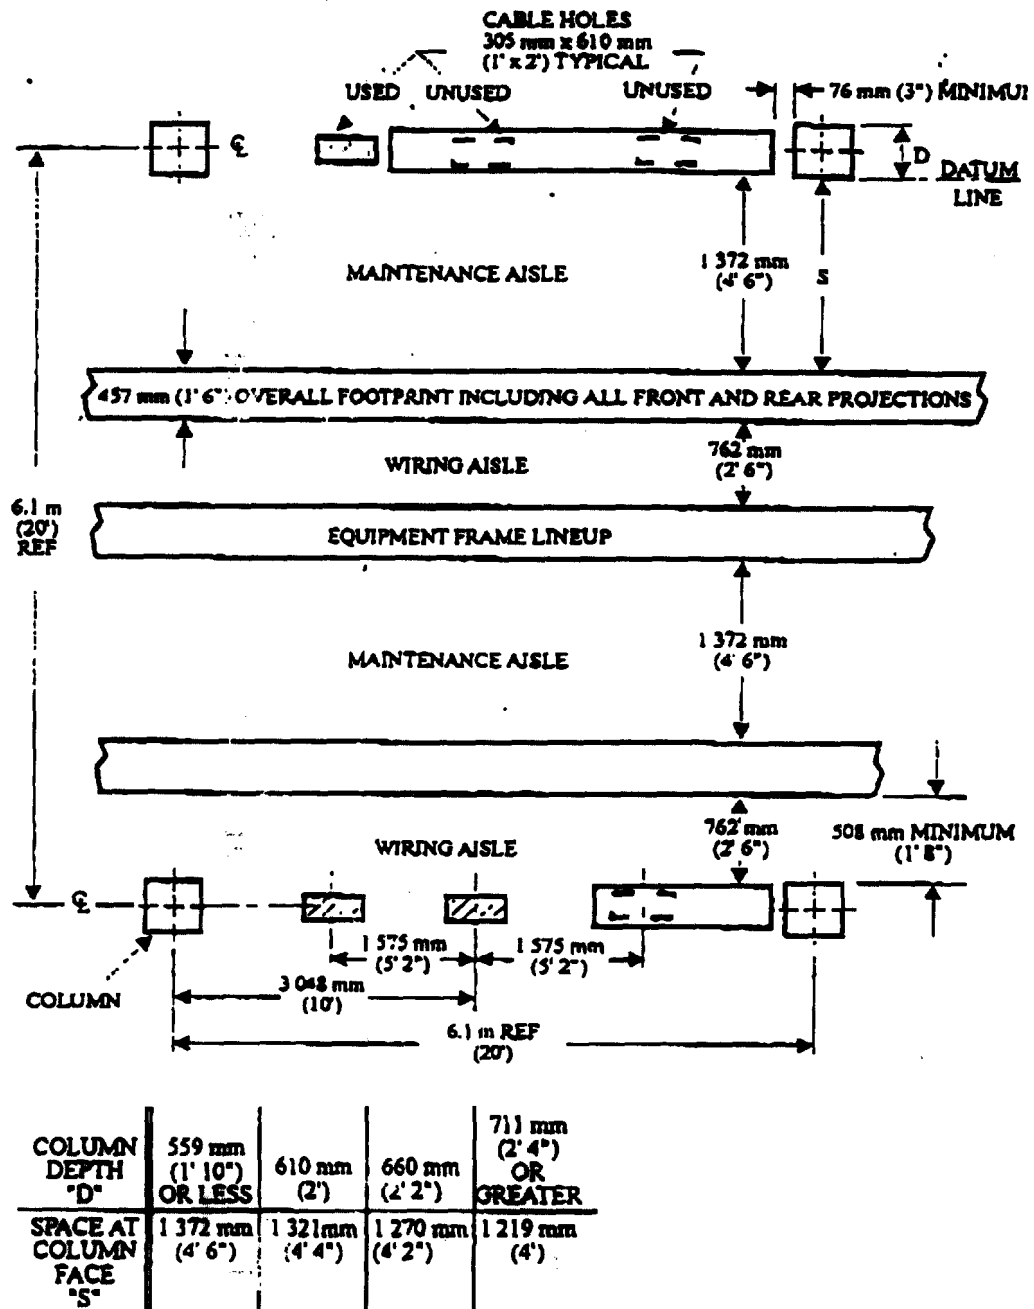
Typical 4-Lineup Floor Plan for 457-mm (18-in) Deep Frames
